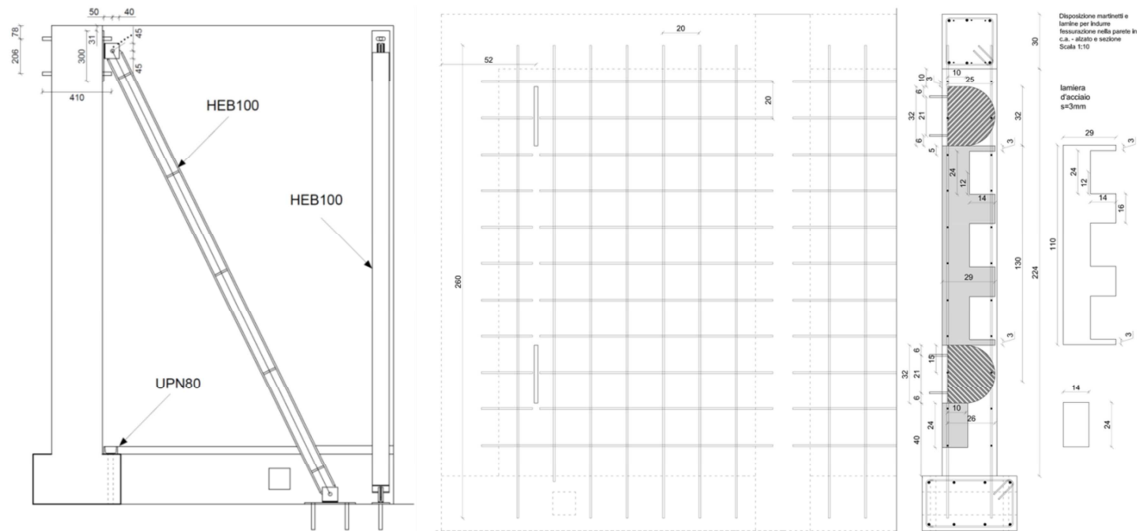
Steel bracings used to stiffen the structural unit (left); crack inducing system within concrete walls (right)
